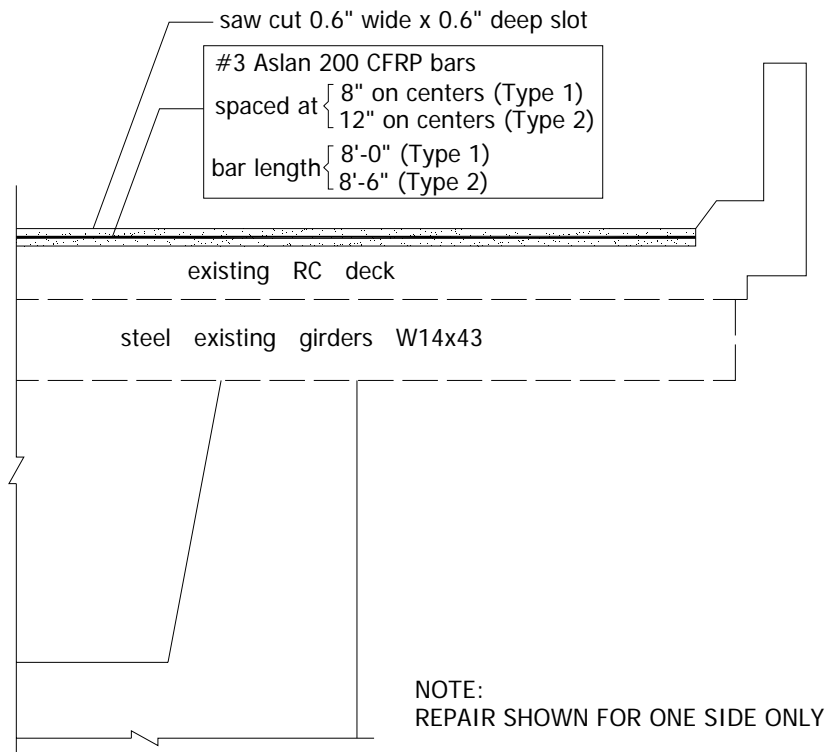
Bridge Strengthening Cross-Section (Not to Scale)
